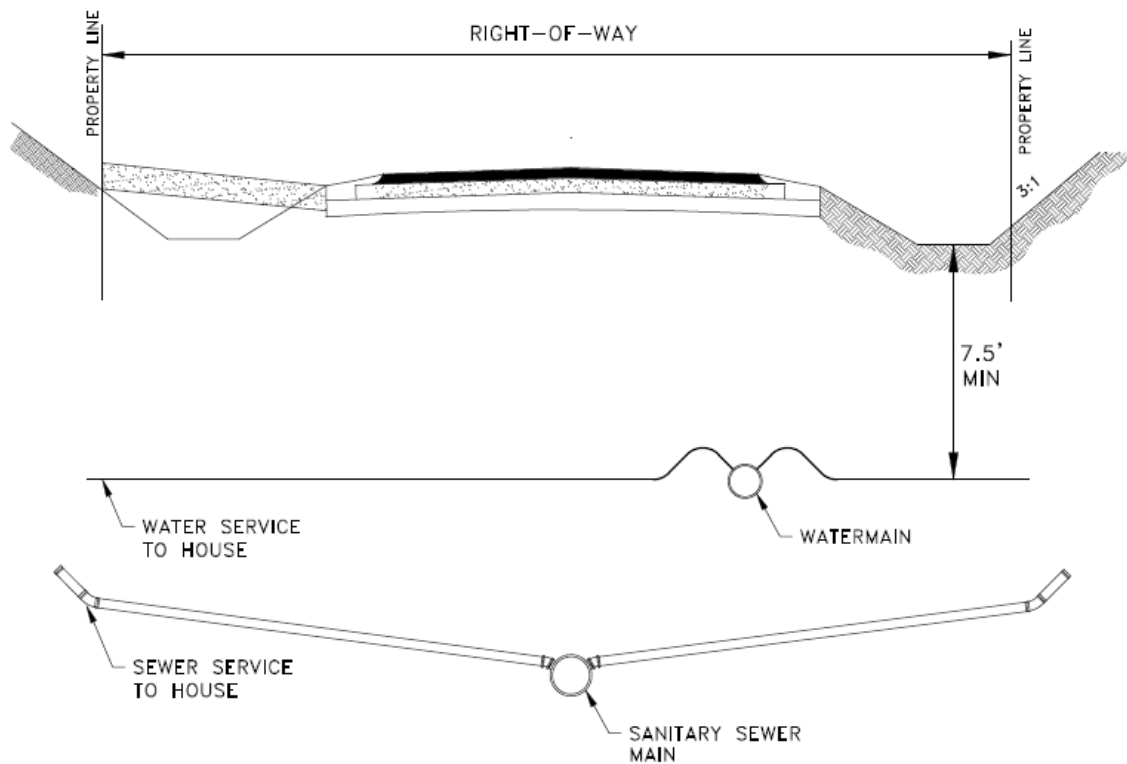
Typical Location of Sanitary Sewer and Watermain – Rural Section
